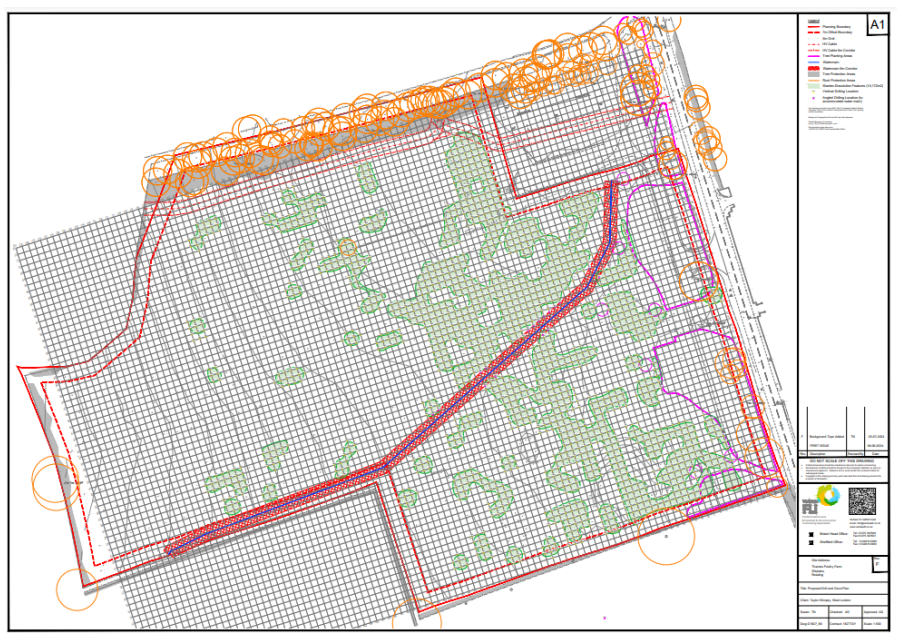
2024 drilling and grouting plan © Vertase FLI
